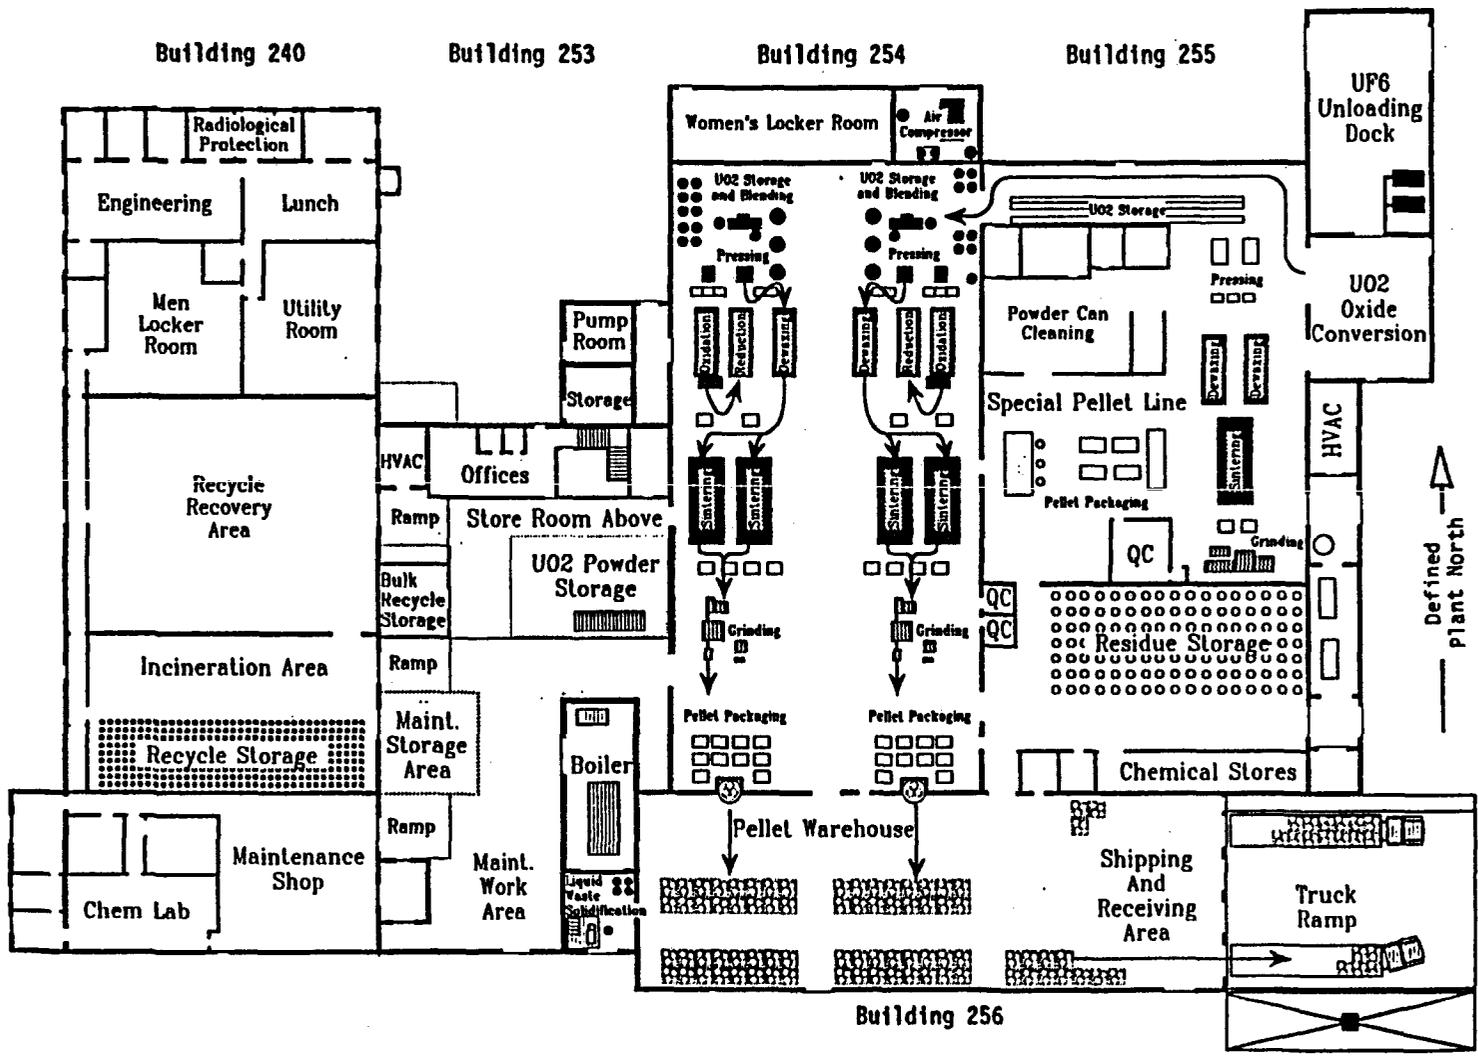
BUILDING AND EQUIPMENT LAYOUT
